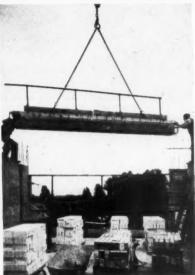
(above). Withdrawing cores from a precast stair flight. Fig. 11 (above right), Hoisting a precast stair into position. Fig. 12 (right). Raising a balcony off a shutter. Fig. 13 (extreme right). Lowering an edge beam into position. Note temporary safety rail.
